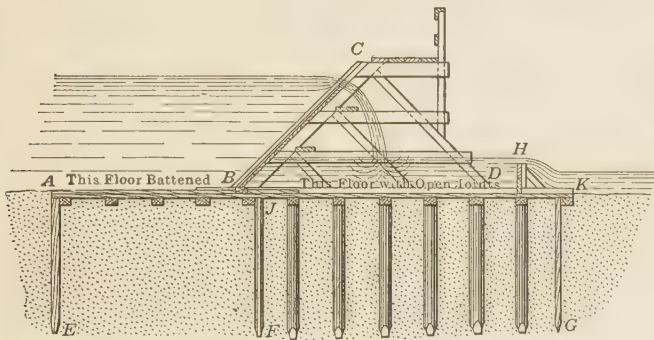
Improved type of wooden frame diversion weir by W. C. Hammatt. (*Trans., Am. Soc. C. E., Dec., 1913.*)
